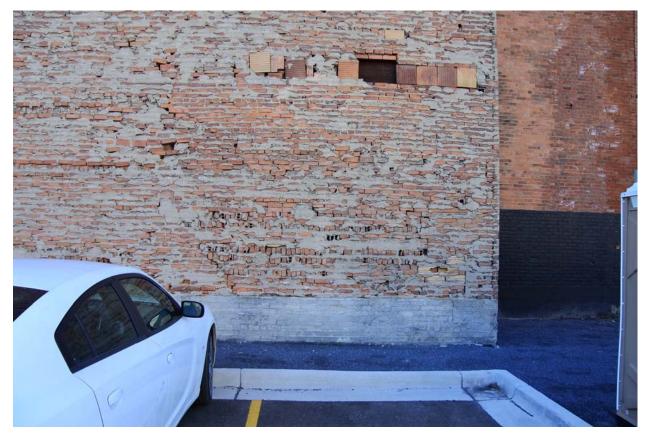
Area of rubble brickwork on north facade that was not originally an exterior wall surface. Most if not all of the north wall will either need to be parged and covered with another material, or rebuilt as a brick veneer with masonry back-up wythe.
